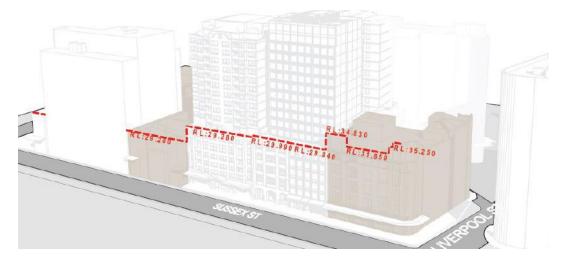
Prevailing Street wall height along Sussex Street, local heritage items at 345B Sussex Street (Former Commerce Building, I1966) and 365-375 Sussex Street (Former Commerce House, I1967) shown hatched in brown
